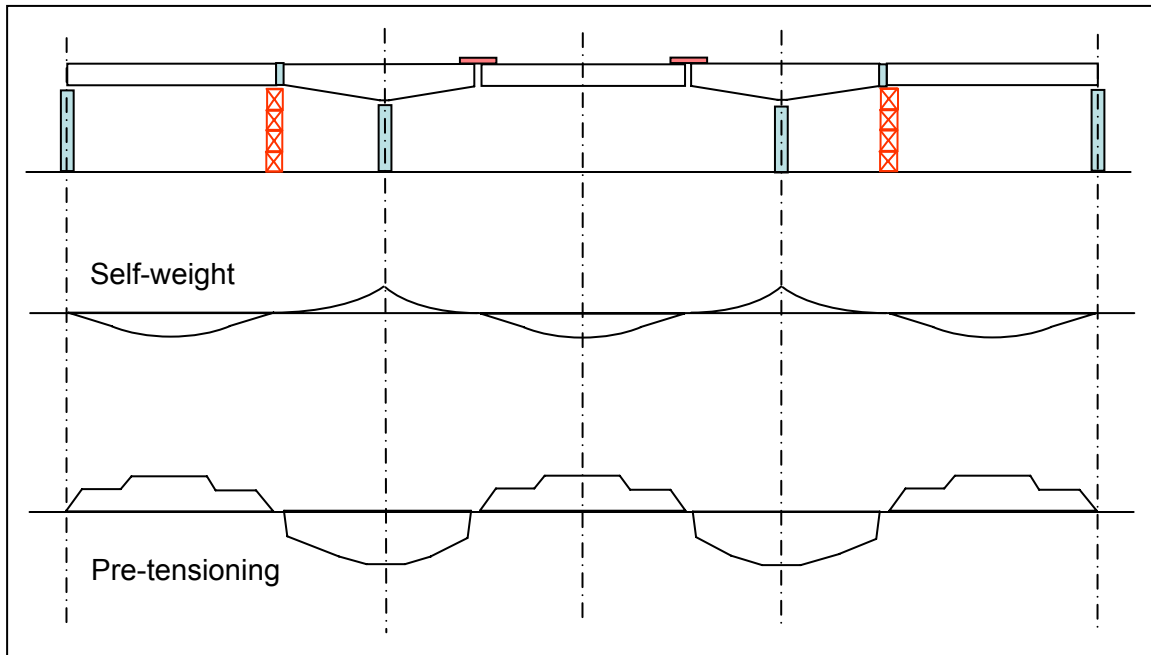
Spliced Girder Construction - Self Weight and Pretensioning Moments
